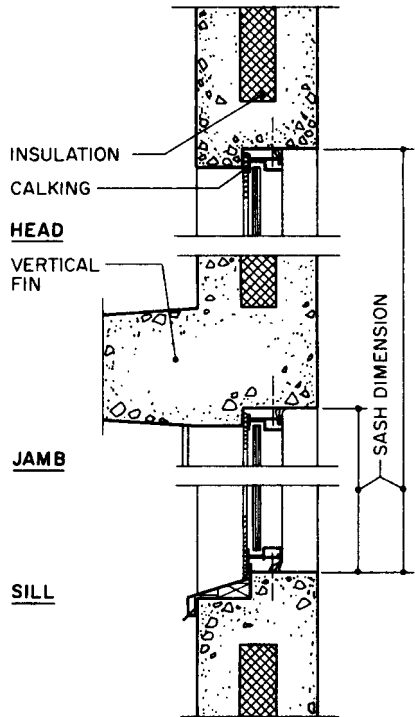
Window installed in precast-concrete sandwich wall panel.
